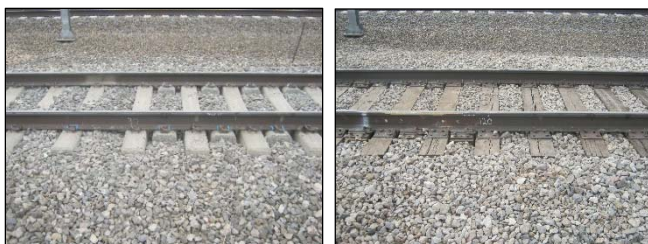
(left) Concrete Crib Ties and (right) Wood Crib Ties at FAST
